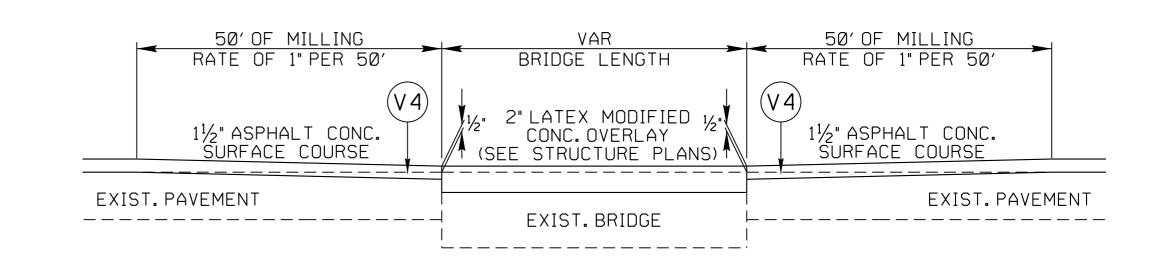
FOR MILLING UNDER BRIDGES
